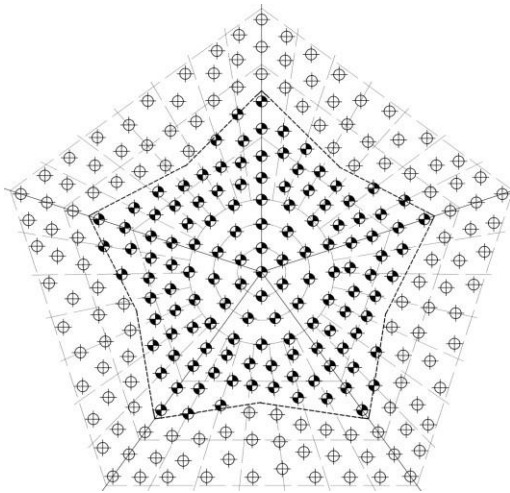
Piles layout. Piles are 65 m and 55 m long, 2 m diameter.
